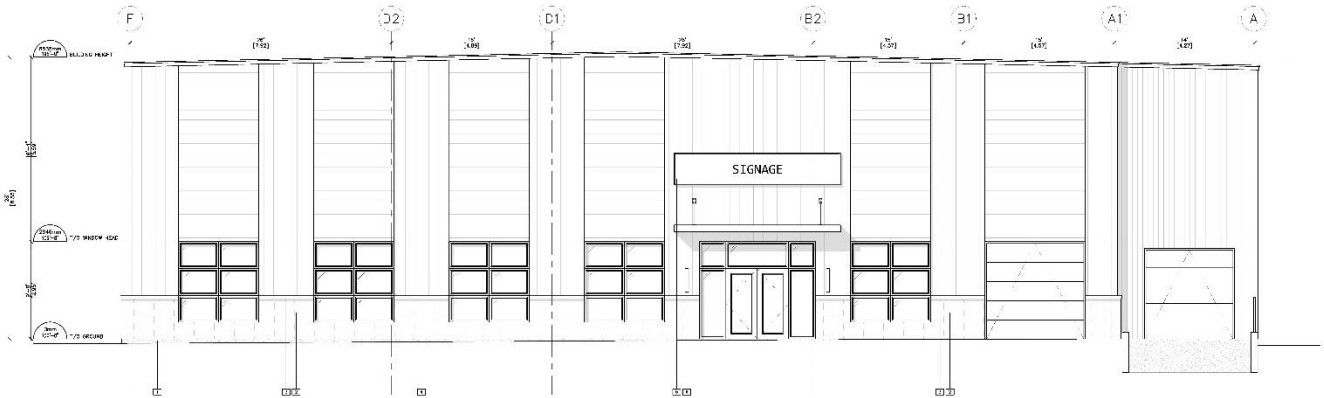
Elevation Drawing of the Front (East) Façade of the HVAC Retail/Distribution Use
